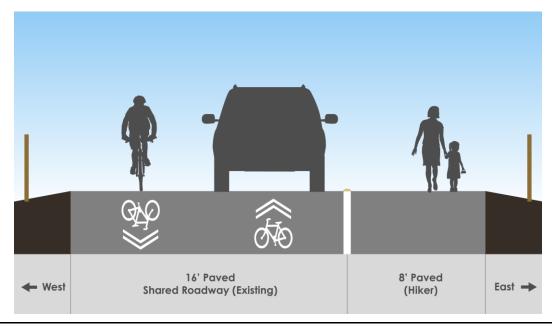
Segment 1 Paved Multiuse Trail Alternative
